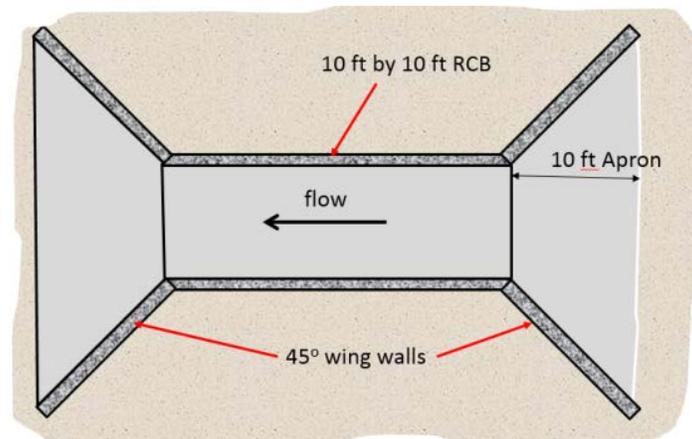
Sketch of Model Culvert Prepared at Lab
